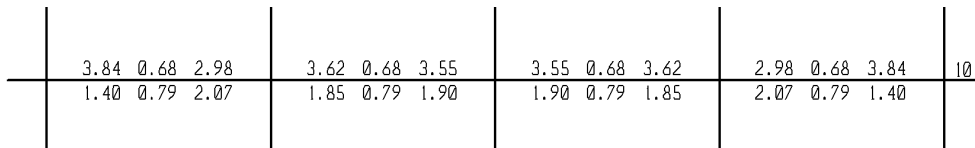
Longitudinal Reinforcement Detail of Beams at 10th story---Static analysis
